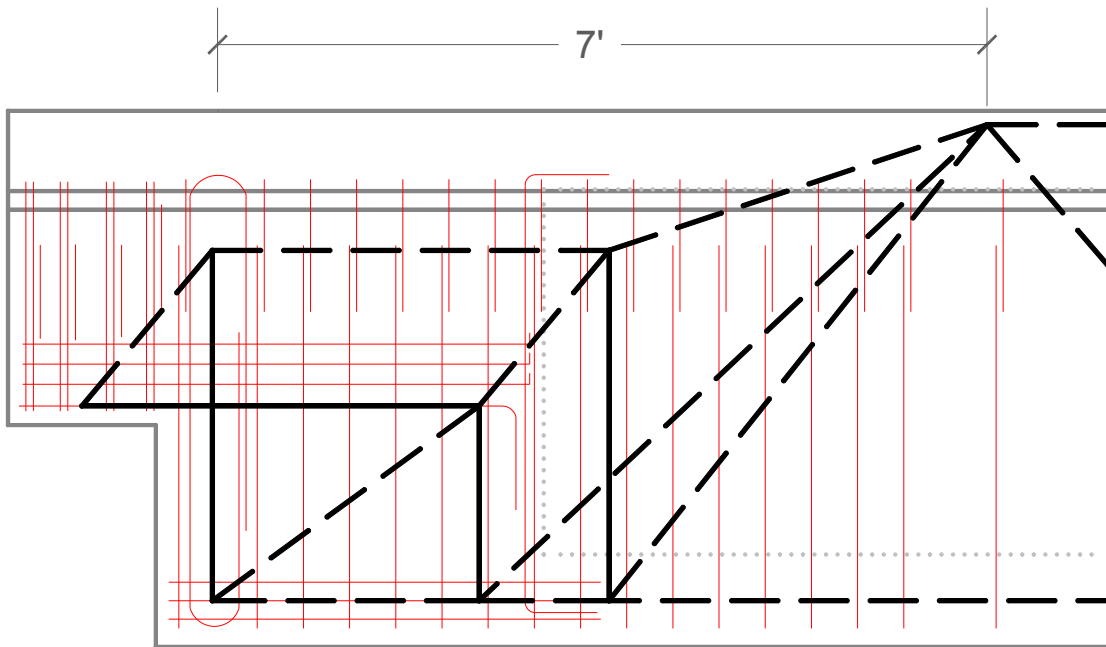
Non-prestressed reinforcement (red) with strut-and-tie model overlay for beam RF-3R-9(c).
